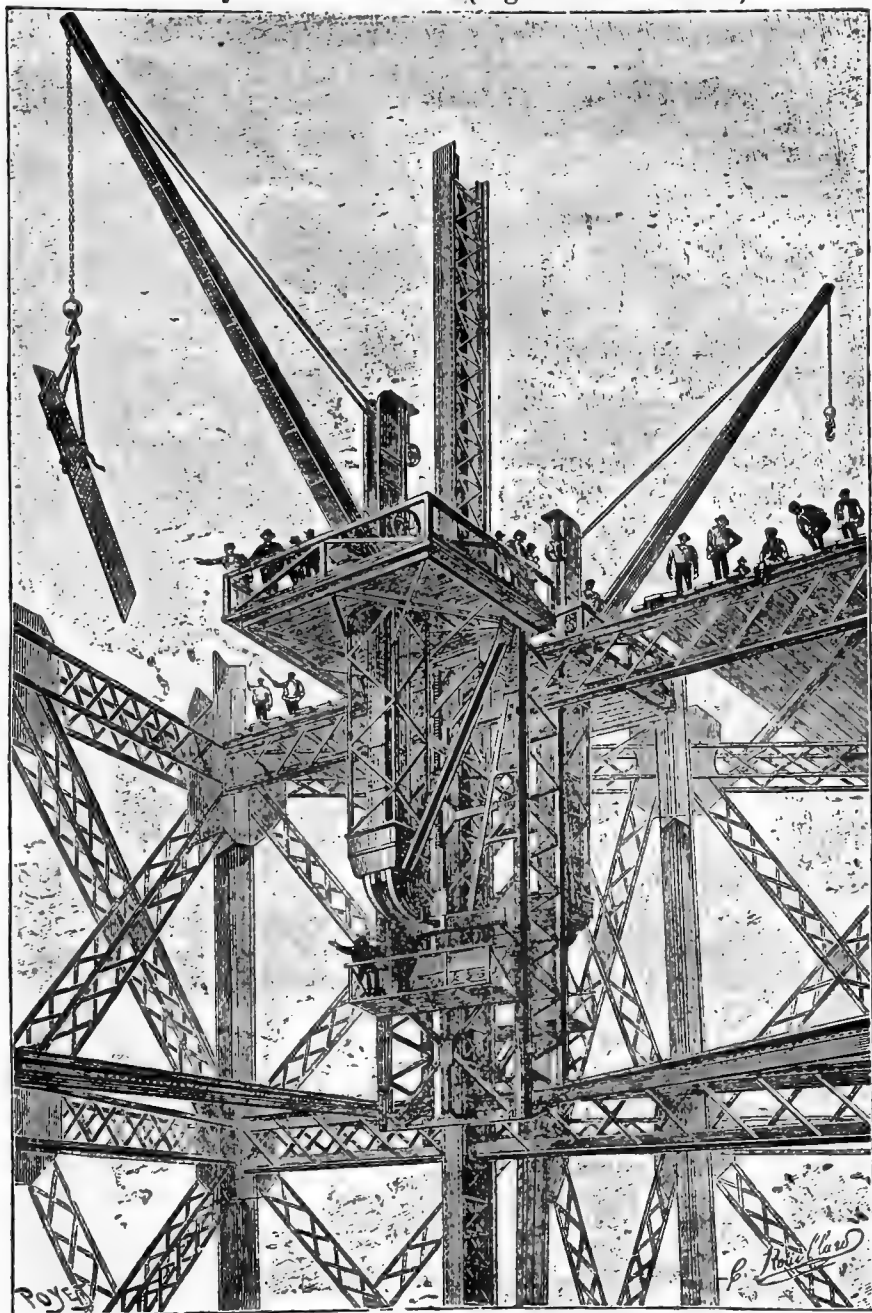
Arrangement of the crane for constructing the tower above the second story. Height 215 meters. December, 1888.
